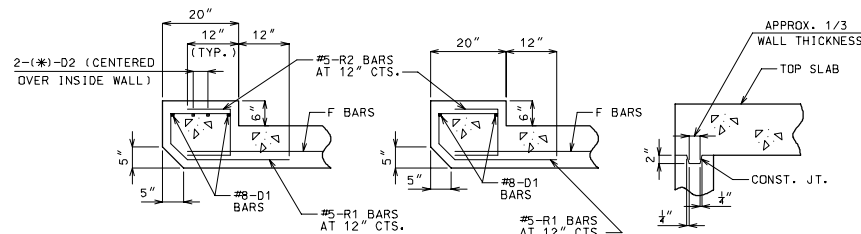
DETAIL OF TRANSVERSE JOINT THRU BARREL OF CULVERT
